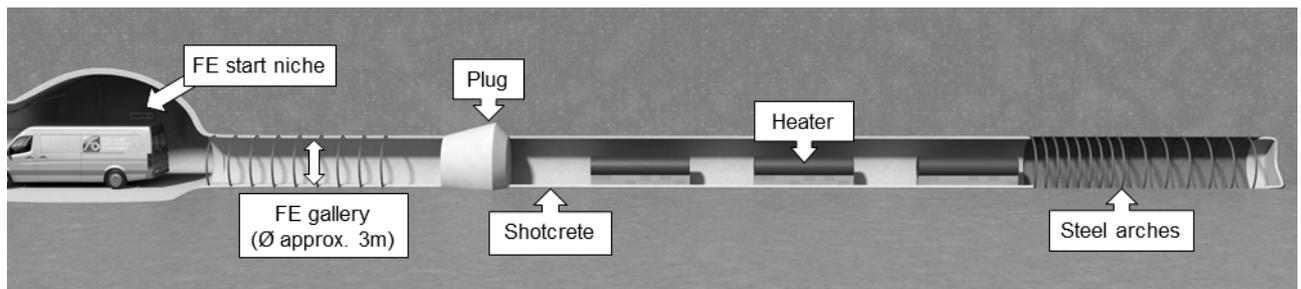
Perspective view of the final set-up of the future FE experiment shown without bentonite pellet backfill, without rock bolts and without sensors (drawing not to scale).
